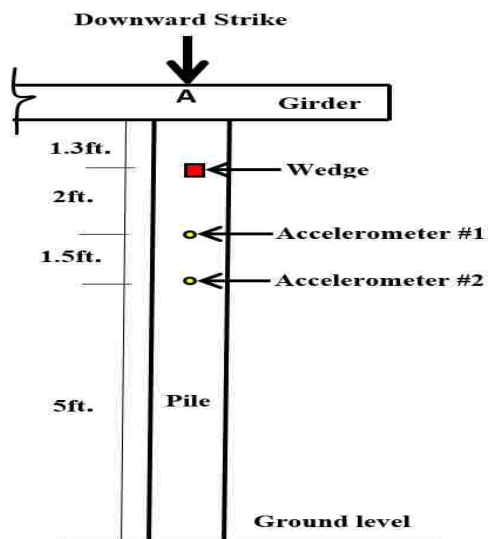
SE Test Setup for Pile 14 of Bridge #6922
